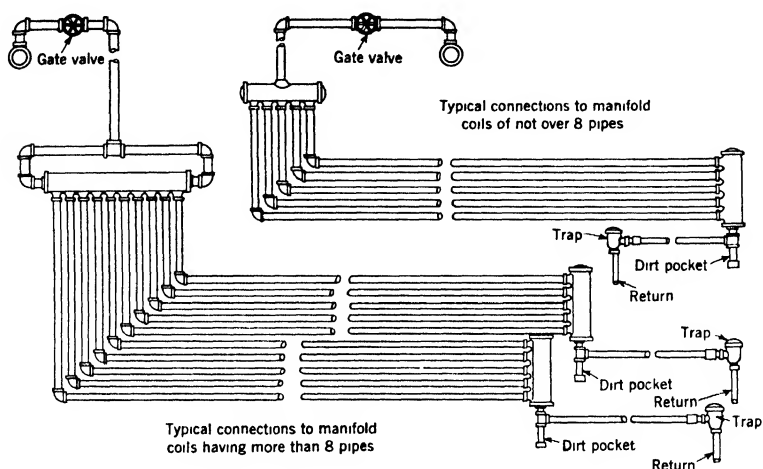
TYPICAL PIPE COIL CONNECTIONS
